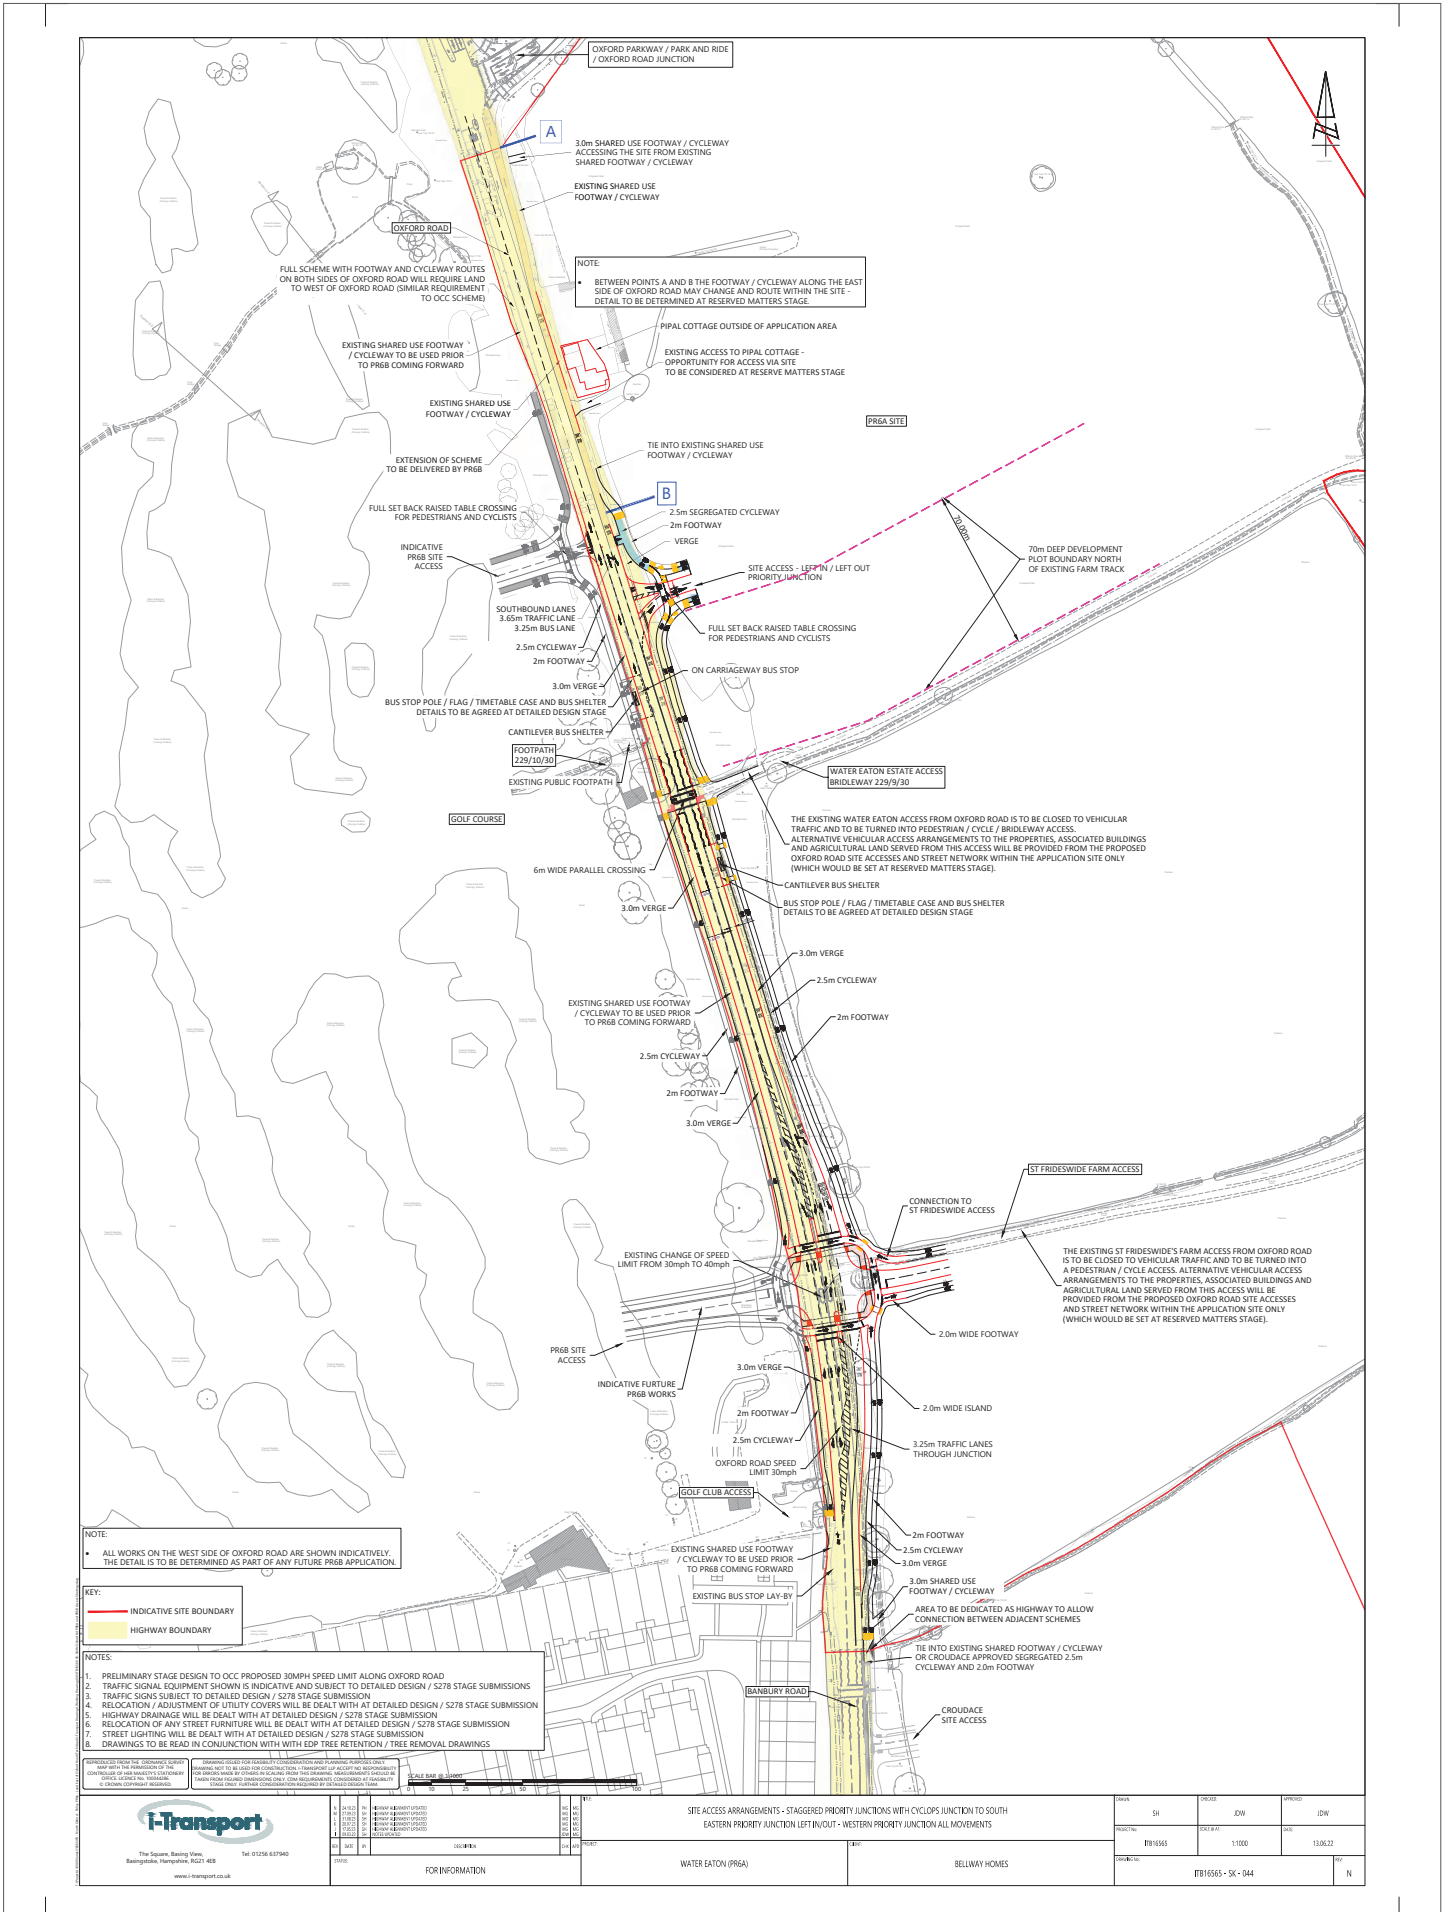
Illustrative Oxford Road arrangement showing how PR6b maybe accessed taking into account our access strategy
